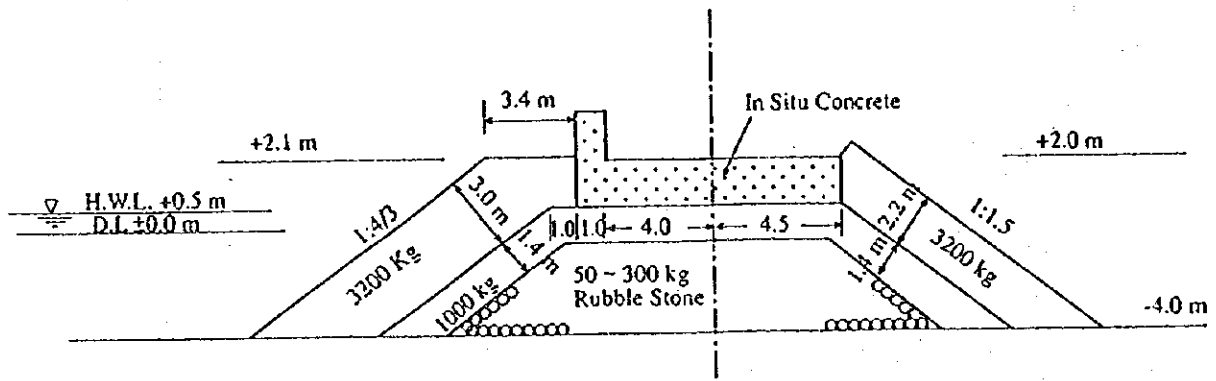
Standard Cross Section of Breakwater Rubble Mound Type (-4.0m)
